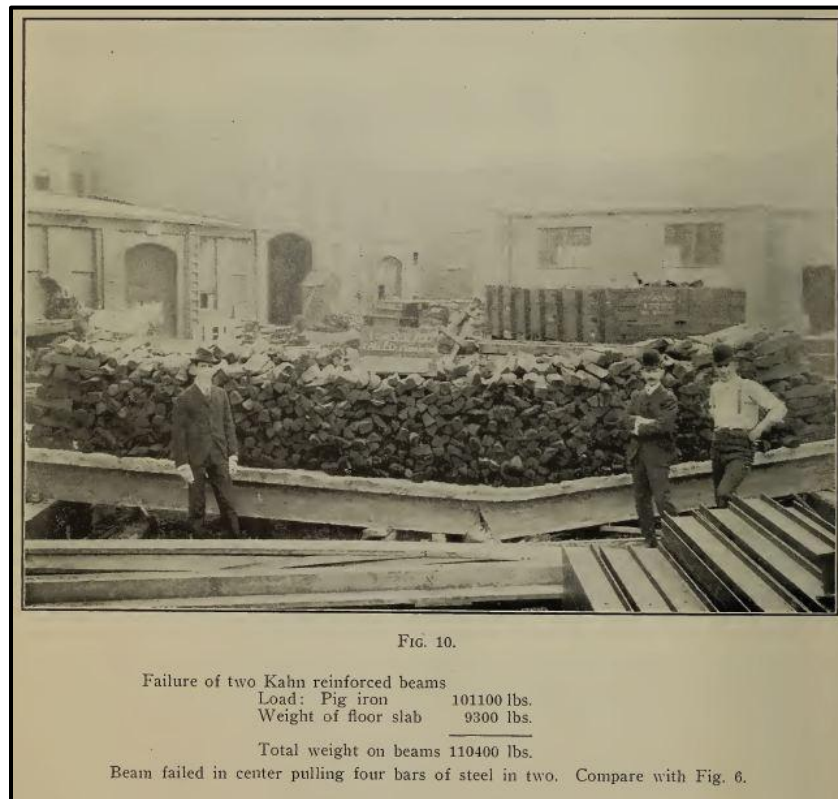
Concrete Failure Using the Kahn Bar for Reinforcement.
